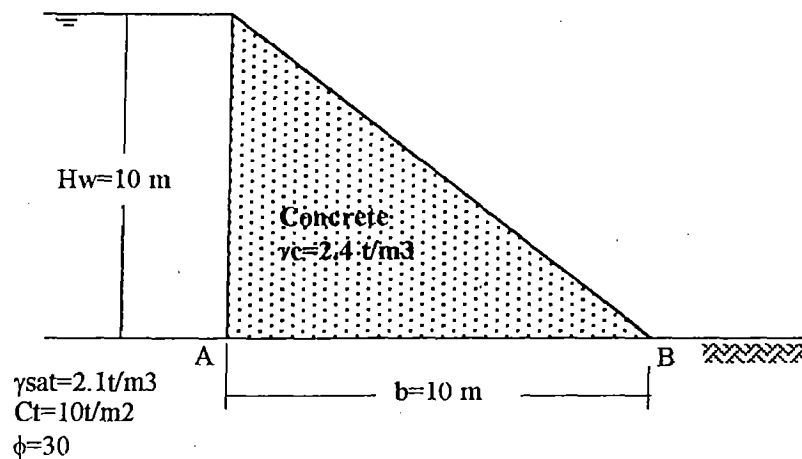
Design Example of Simple Hydraulic Structure Founded on Clayey Soil
